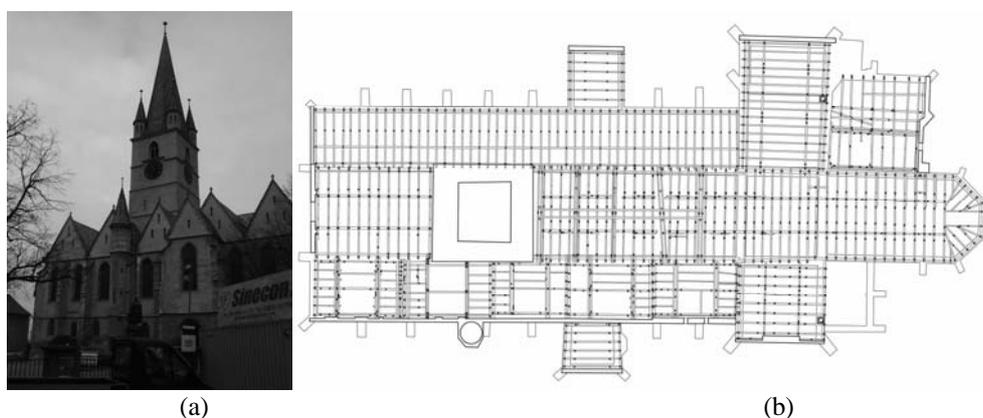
The roof structure of the Evangelical church in Sibiu (a) southern façade, (b) plan
